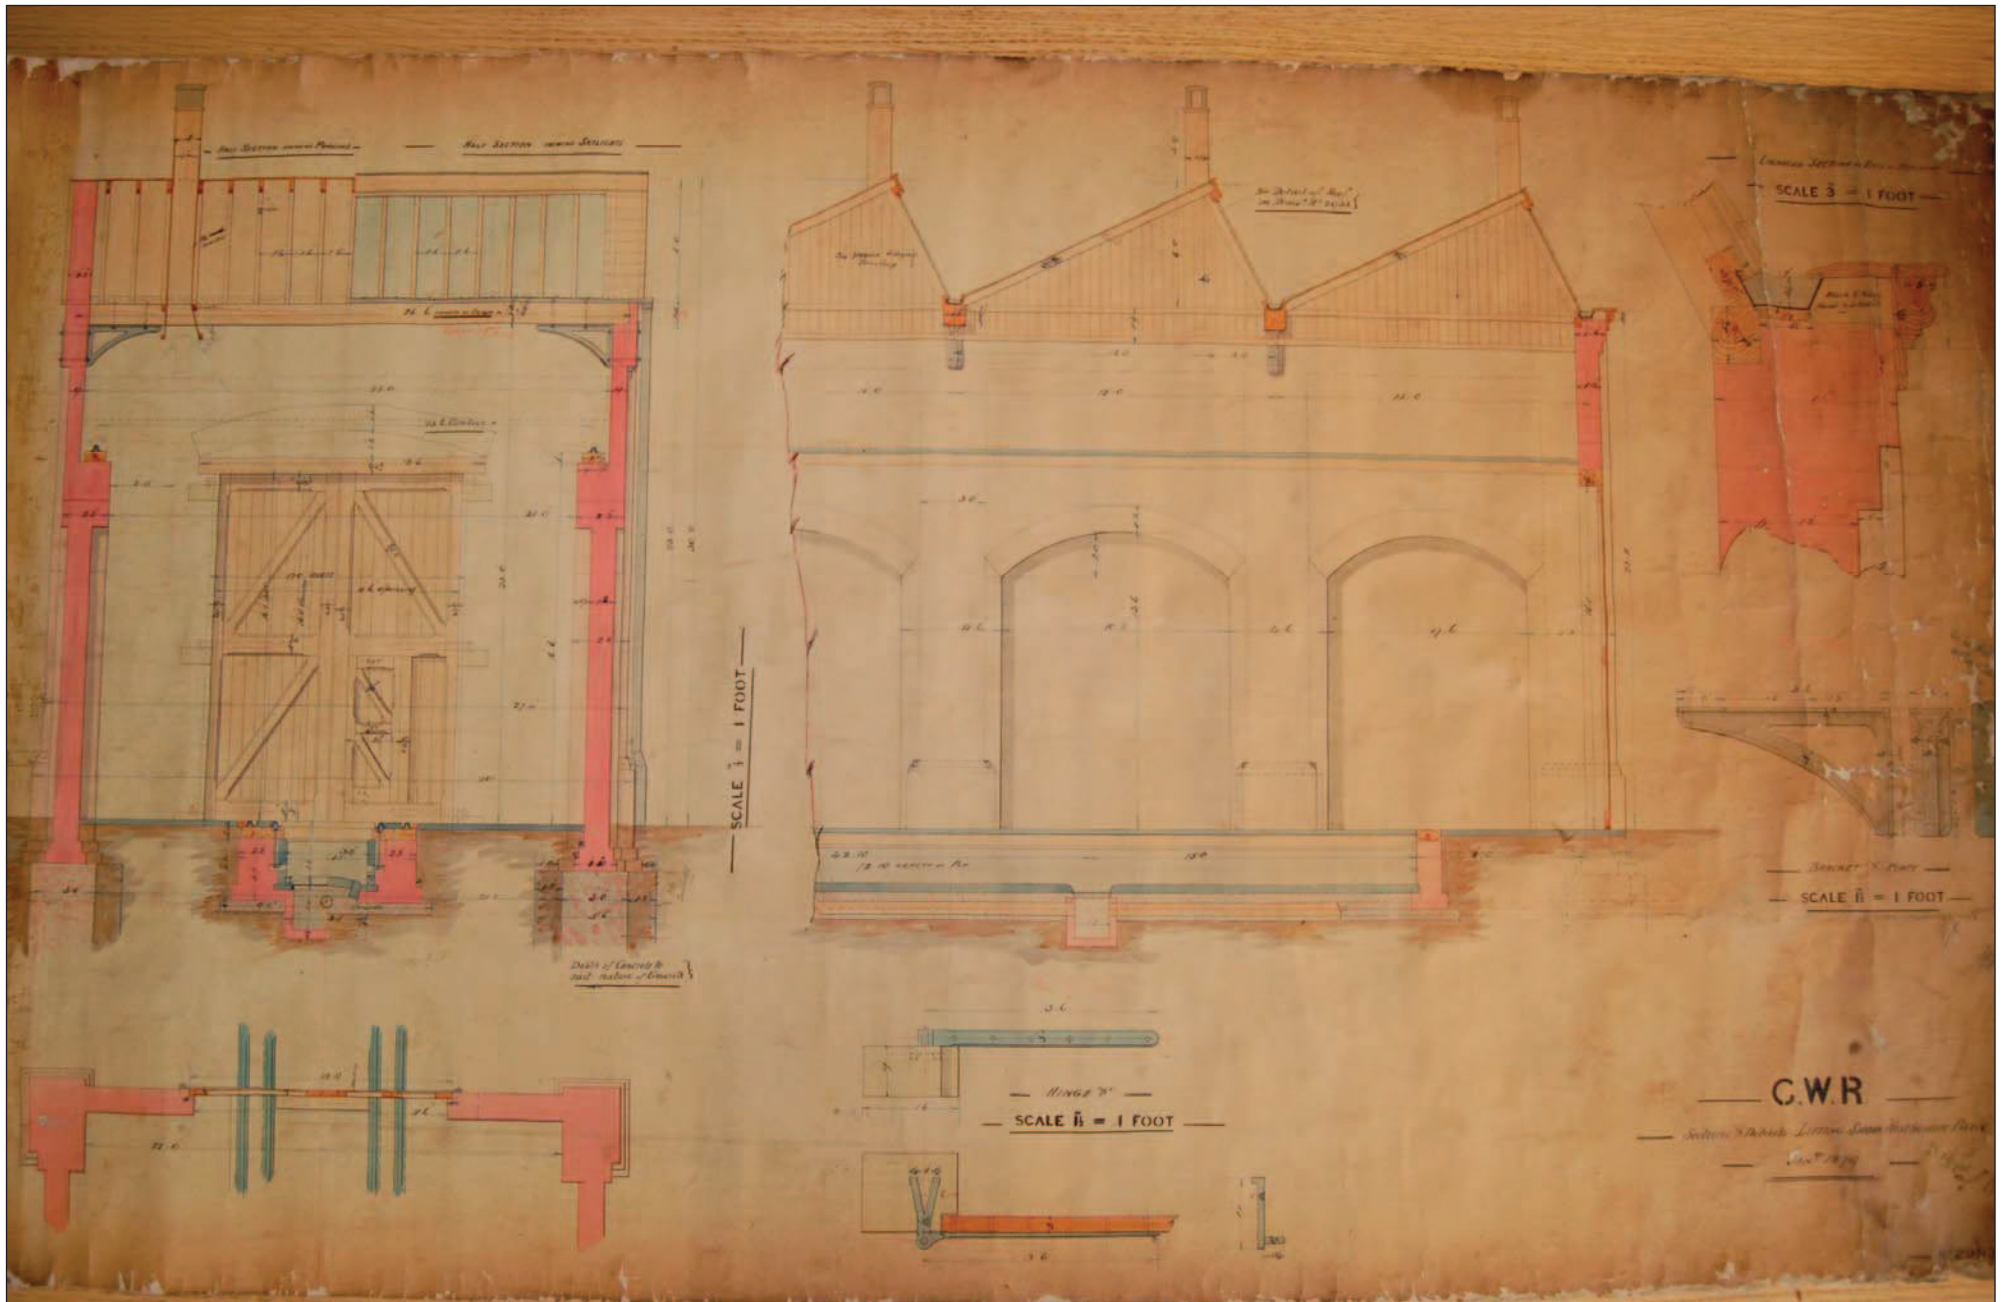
b: 1879 Proposed lifting shop; plan and elevation
